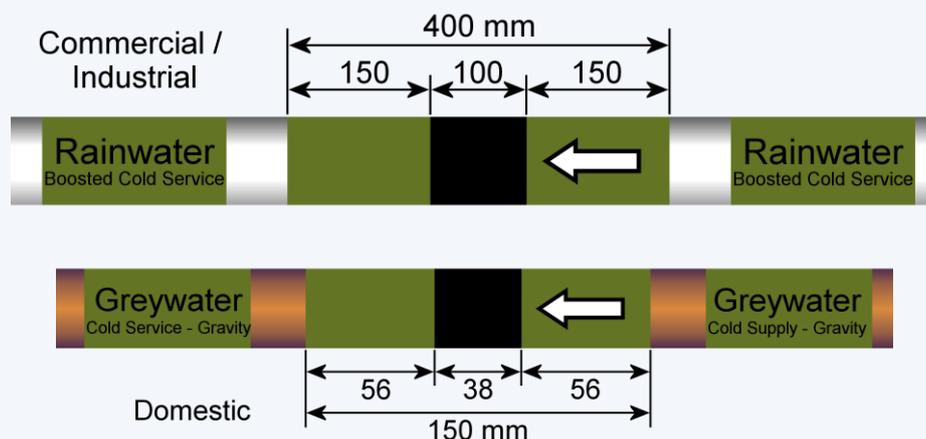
examples of recommended marking and labelling for pipework inside buildings
